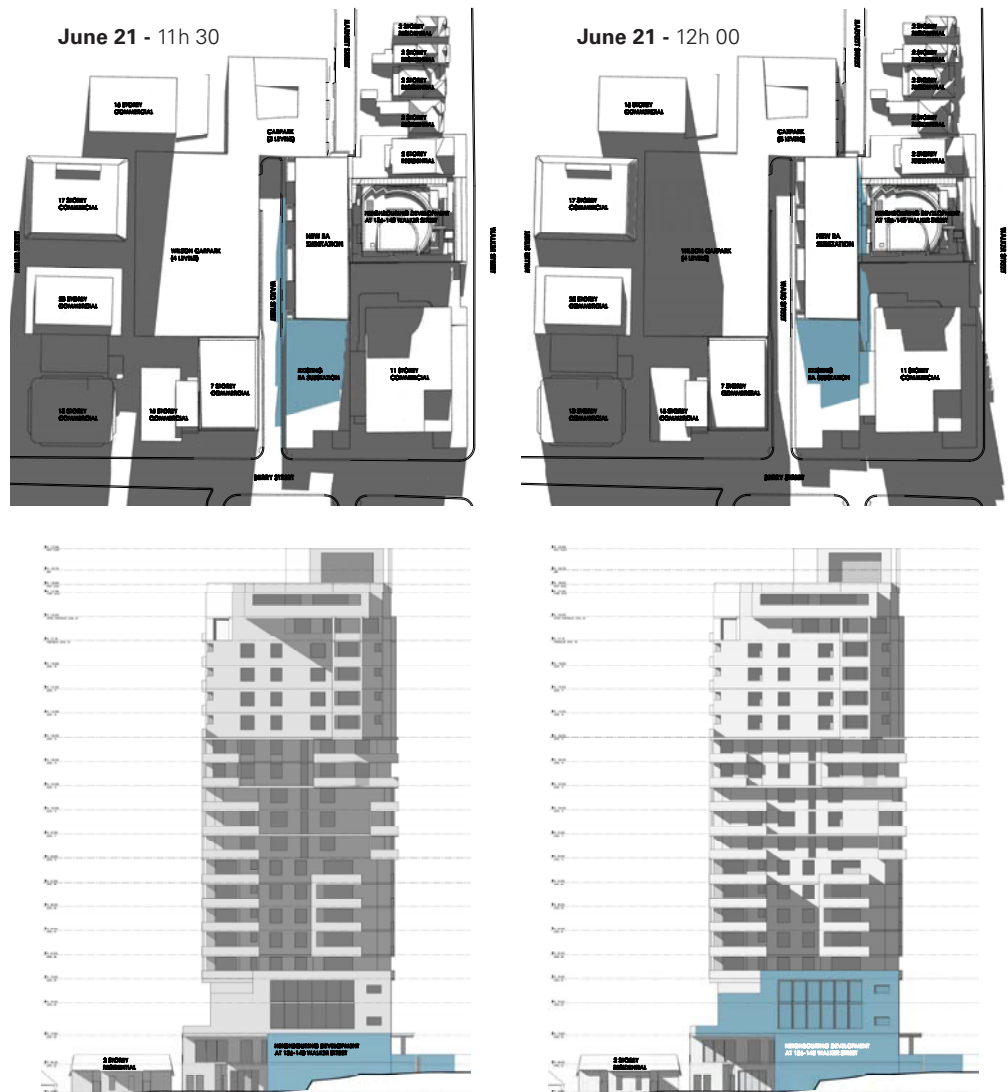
Shadow diagrams for the Winter Solstice, western elevation of proposed 136-140 Walker Street
